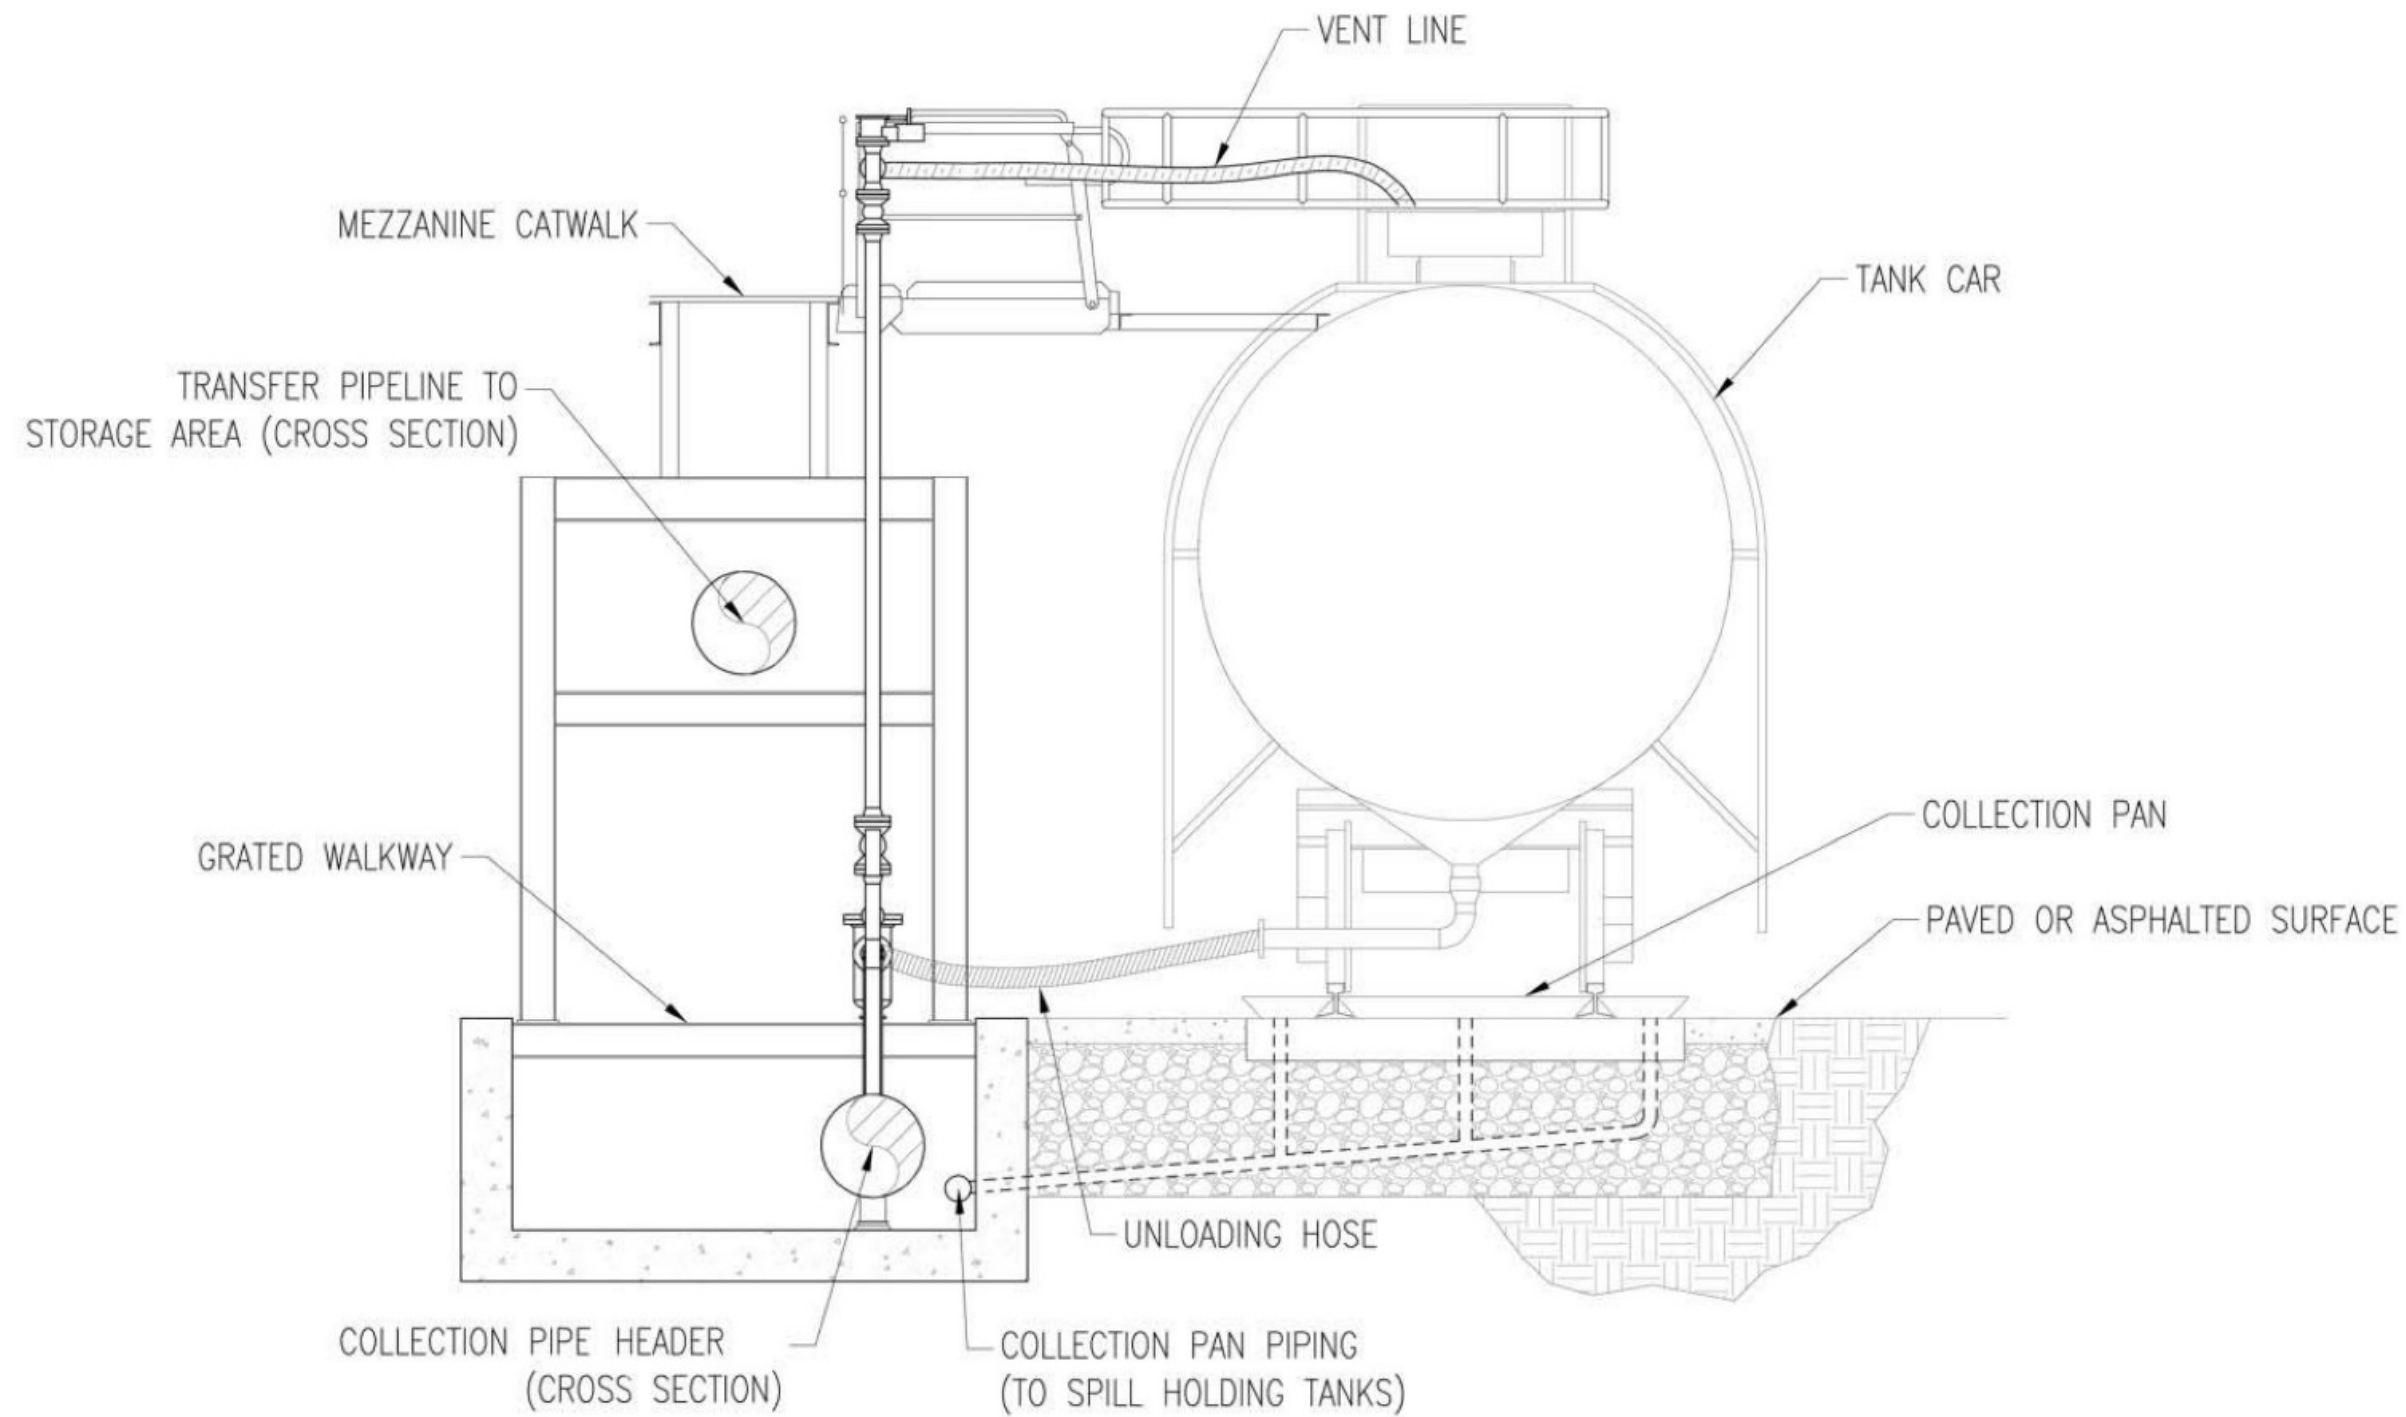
Typical Railcar Unloading Station Cross-Section
